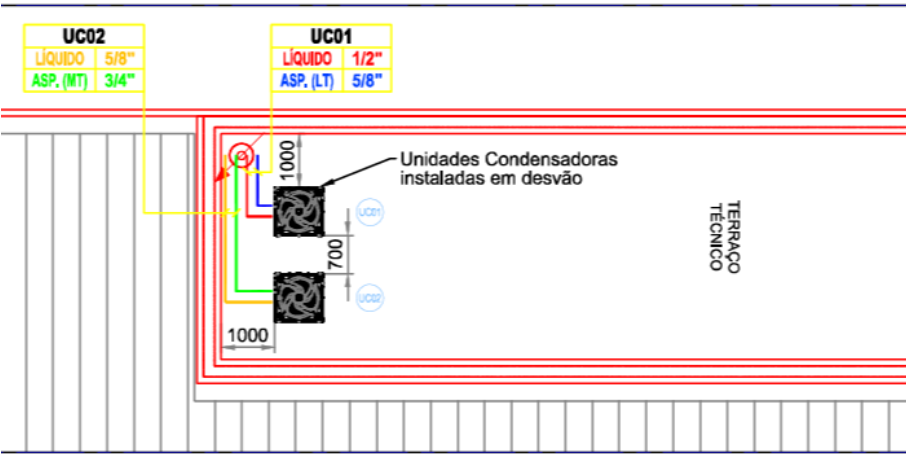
Connection of RCUs with the piping system on the first floor.
